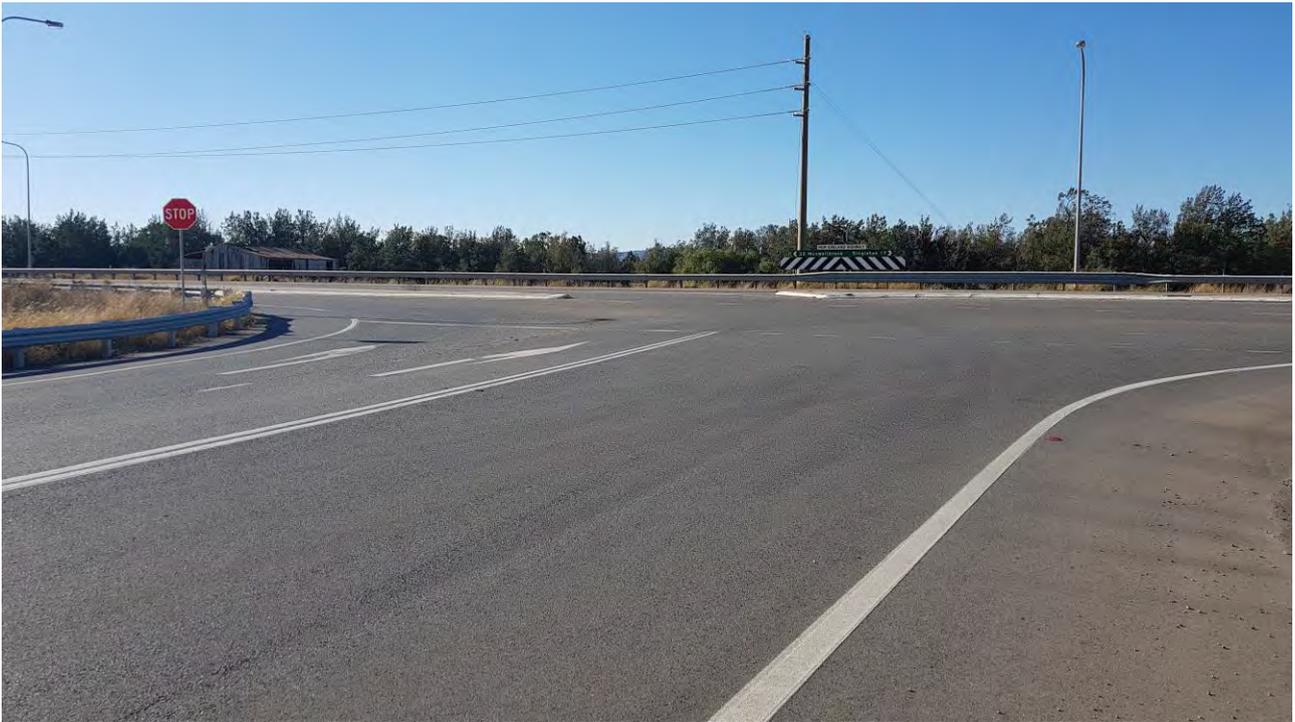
Looking North-West, intersection of New England Highway and Lemington Road, in good condition no visible defects
